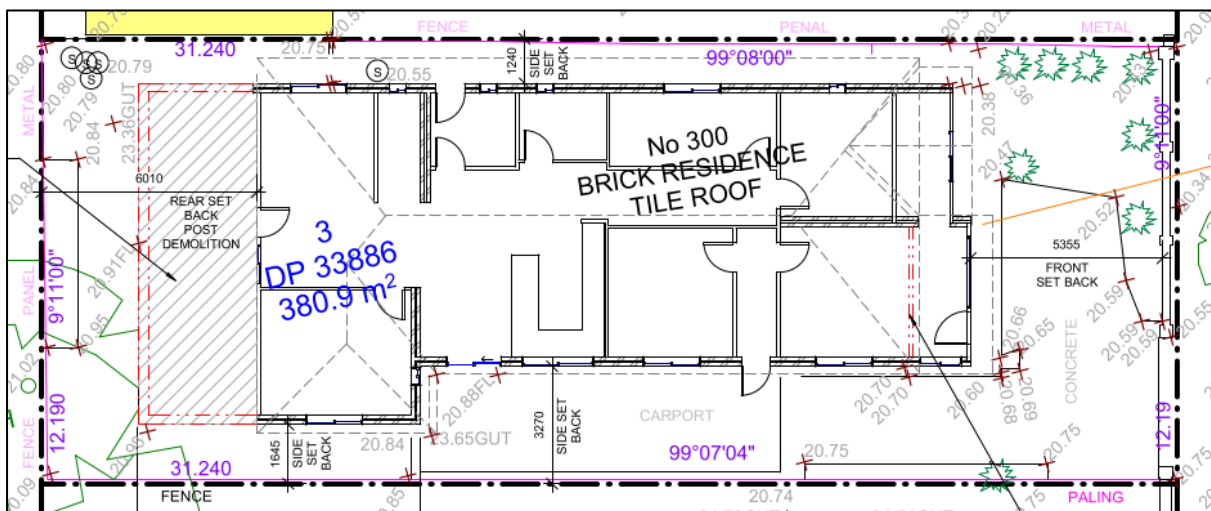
Extract of the proposed demolition plan, with the proposed walls to be demolished shown in hatched red line.
